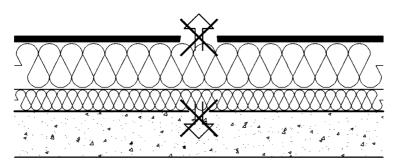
A typical failure for low slope roofing insulation systems. Water has penetrated the roofing membrane and cannot easily be removed from the insulation
